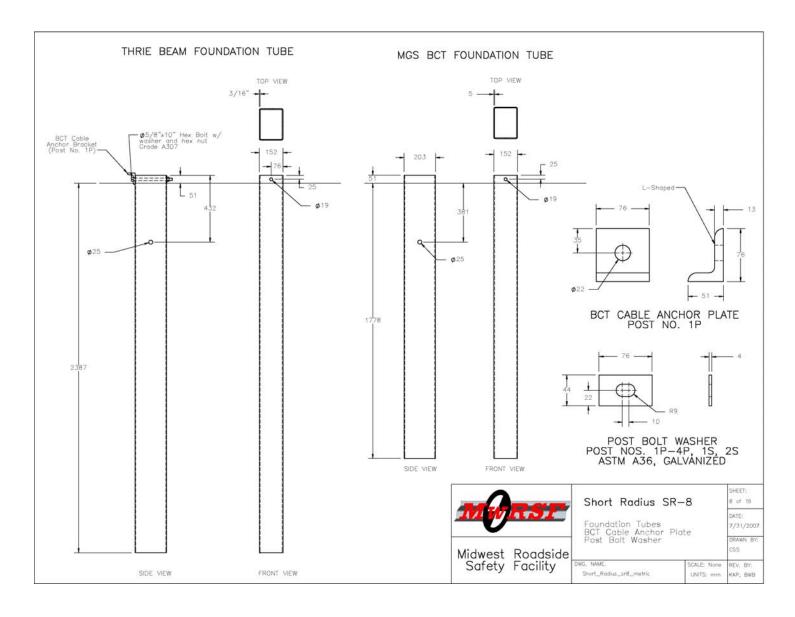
Foundation Tubes, BCT Cable Anchor Plate, and Post Bolt Washer Details
